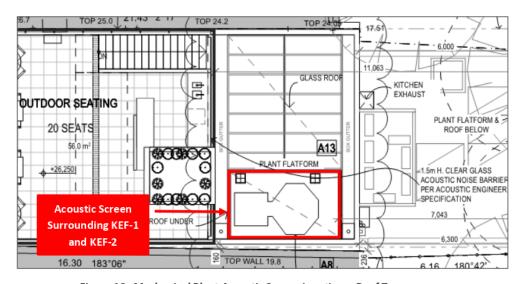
Mechanical Plant Acoustic Screen Location – Roof Terrace (Image Source: YBL Remmus Architecture)
